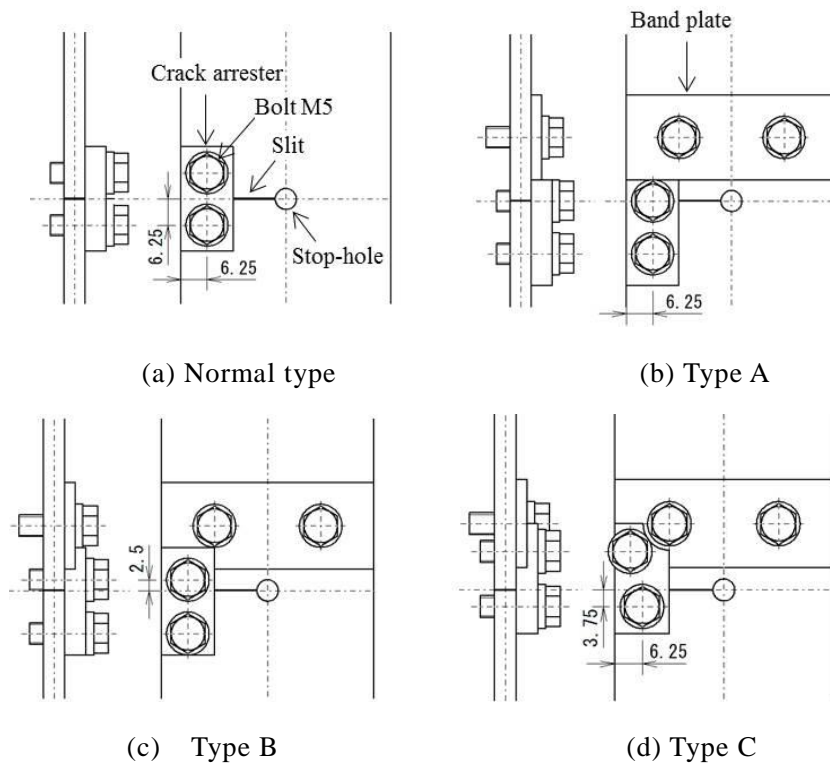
Geometry of band plate specimen with crack on one side.
